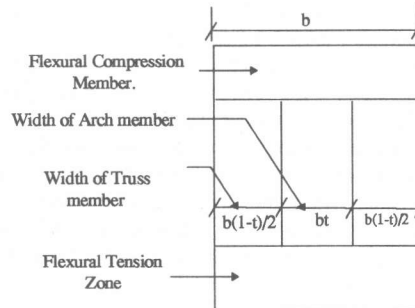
Cross -Section of Concrete Beam in the Modified Lattice Model
